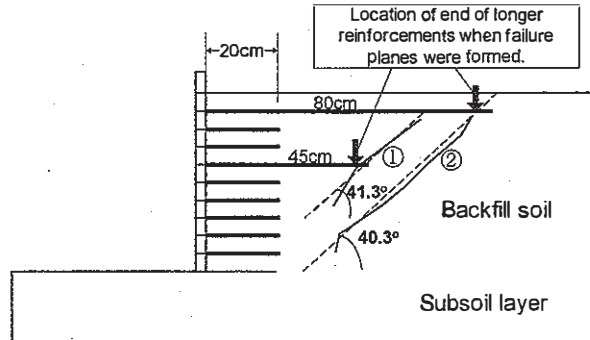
Comparison of locations of failure planes and longer reinforcement layers for reinforced-soil retaining wall type 2.
